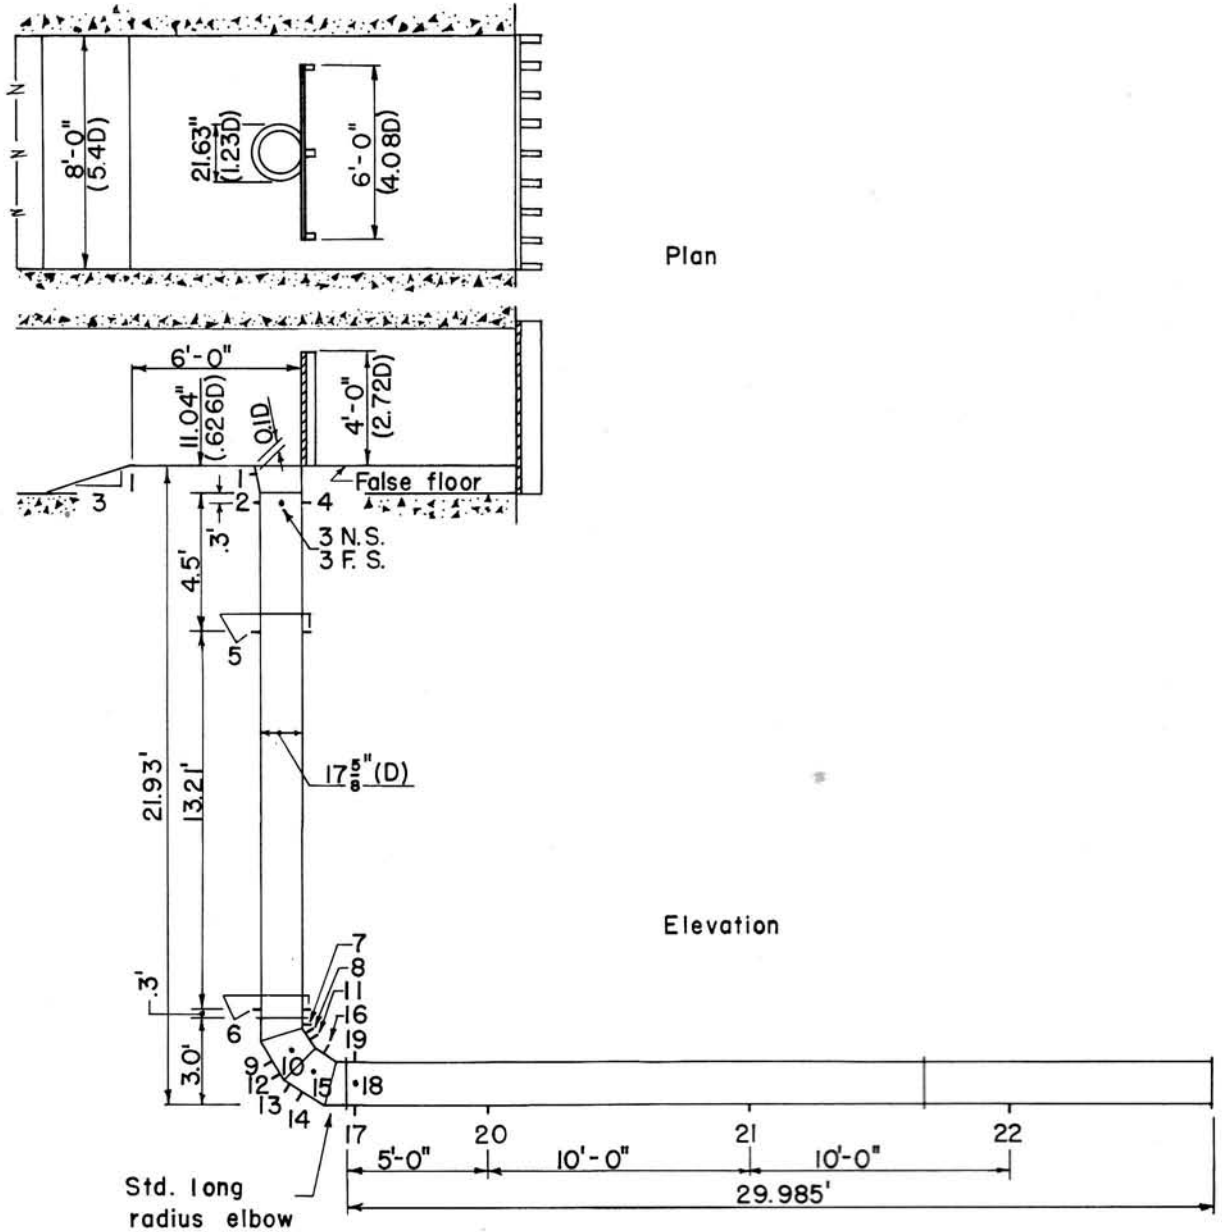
18-in. Steel Pipe Closed Conduit Spillway.
